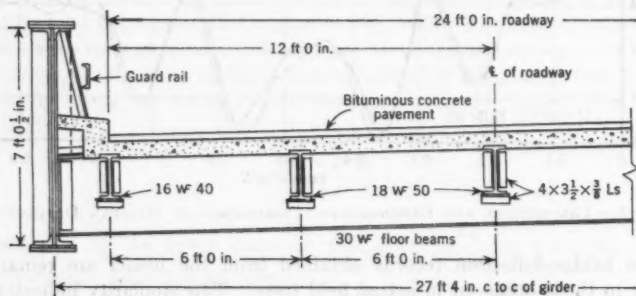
TOWNSEND (MASS.) SOUTH STREET BRIDGE
